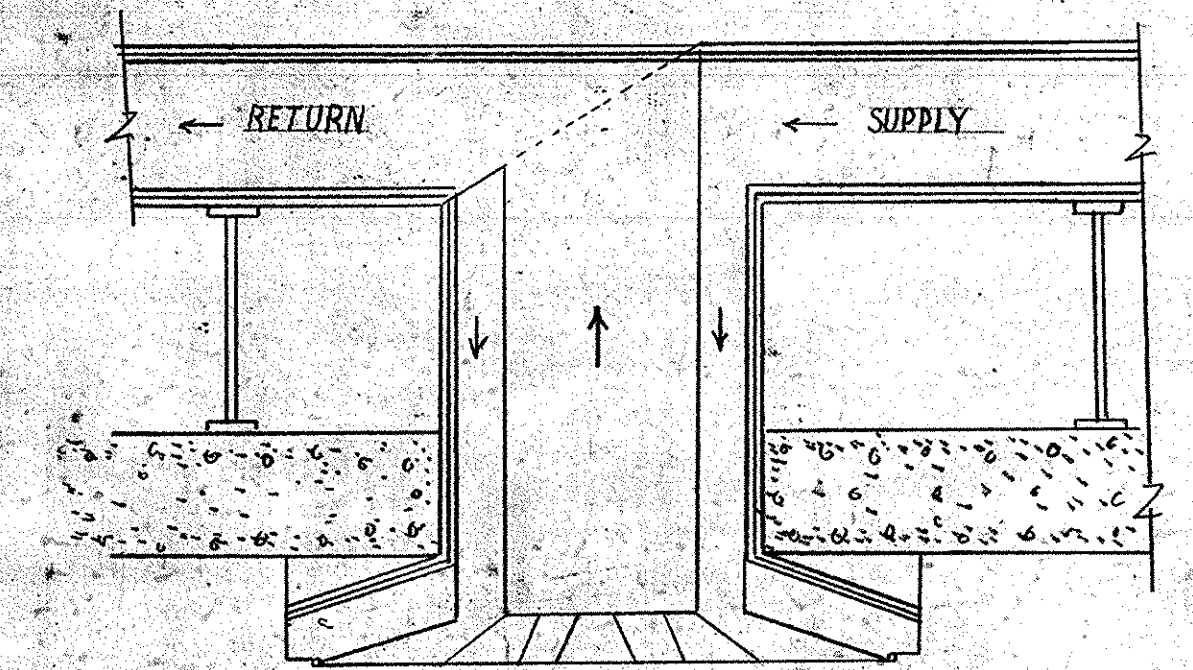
DETAIL OF CONNECTIONS TO 40 ANEMOSTATS ON THE 14TH FLOOR. NO SCALE
